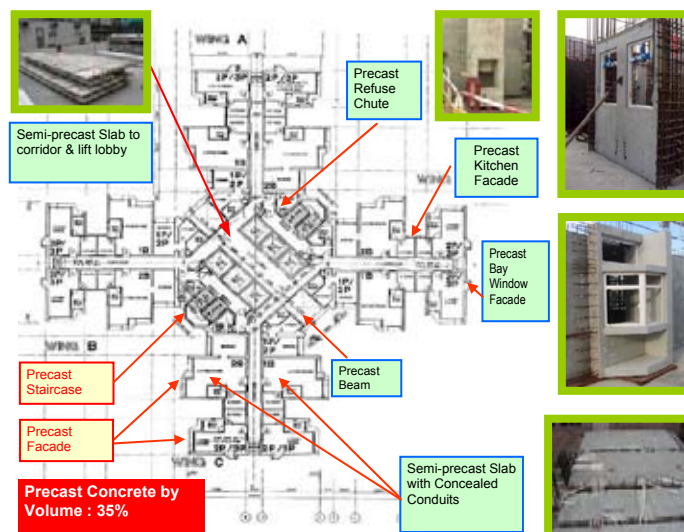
Precast Elements for the New Harmony Blocks constructed in Kwai Chung Estate
